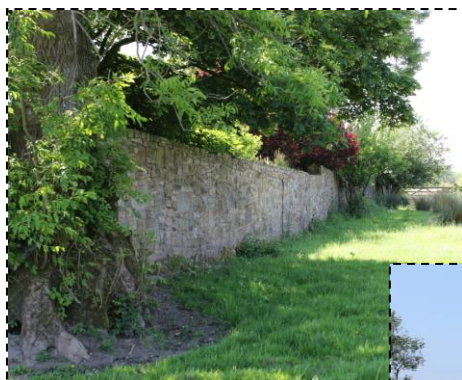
North West side of boundary wall to Farmhouse & Garden
